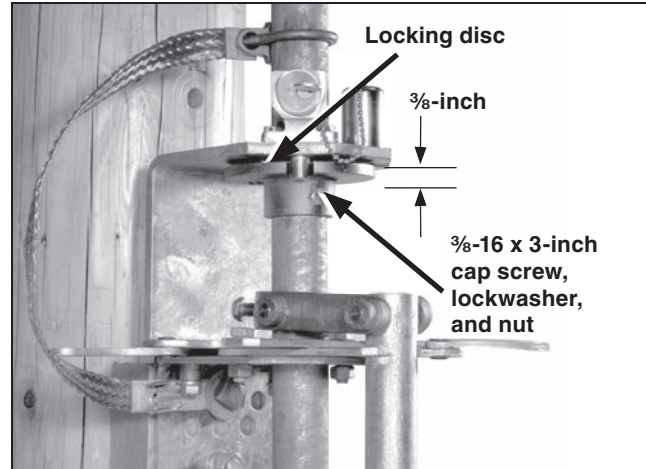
Interphase pipe connecting the switch poles and outboard bearing.
